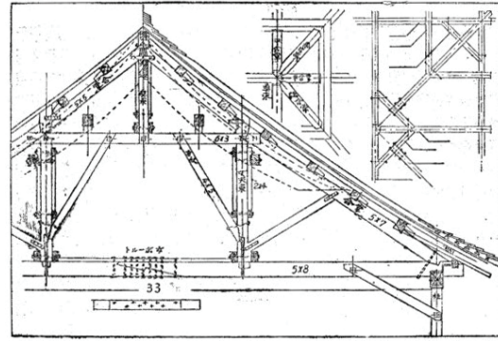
Roof structure of Korean traditional building (Tamotsu, 1919)
